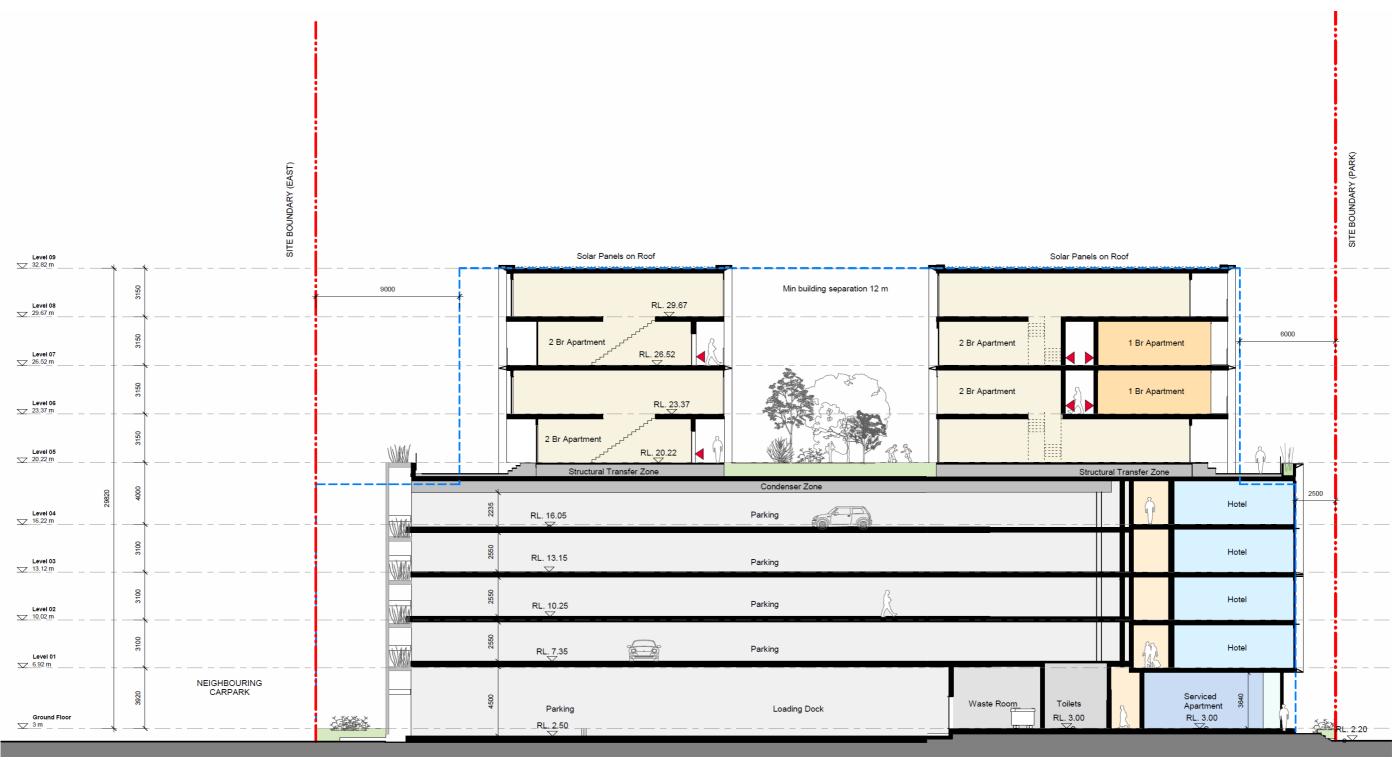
Excerpt of Current East-West Section plan for the development.
